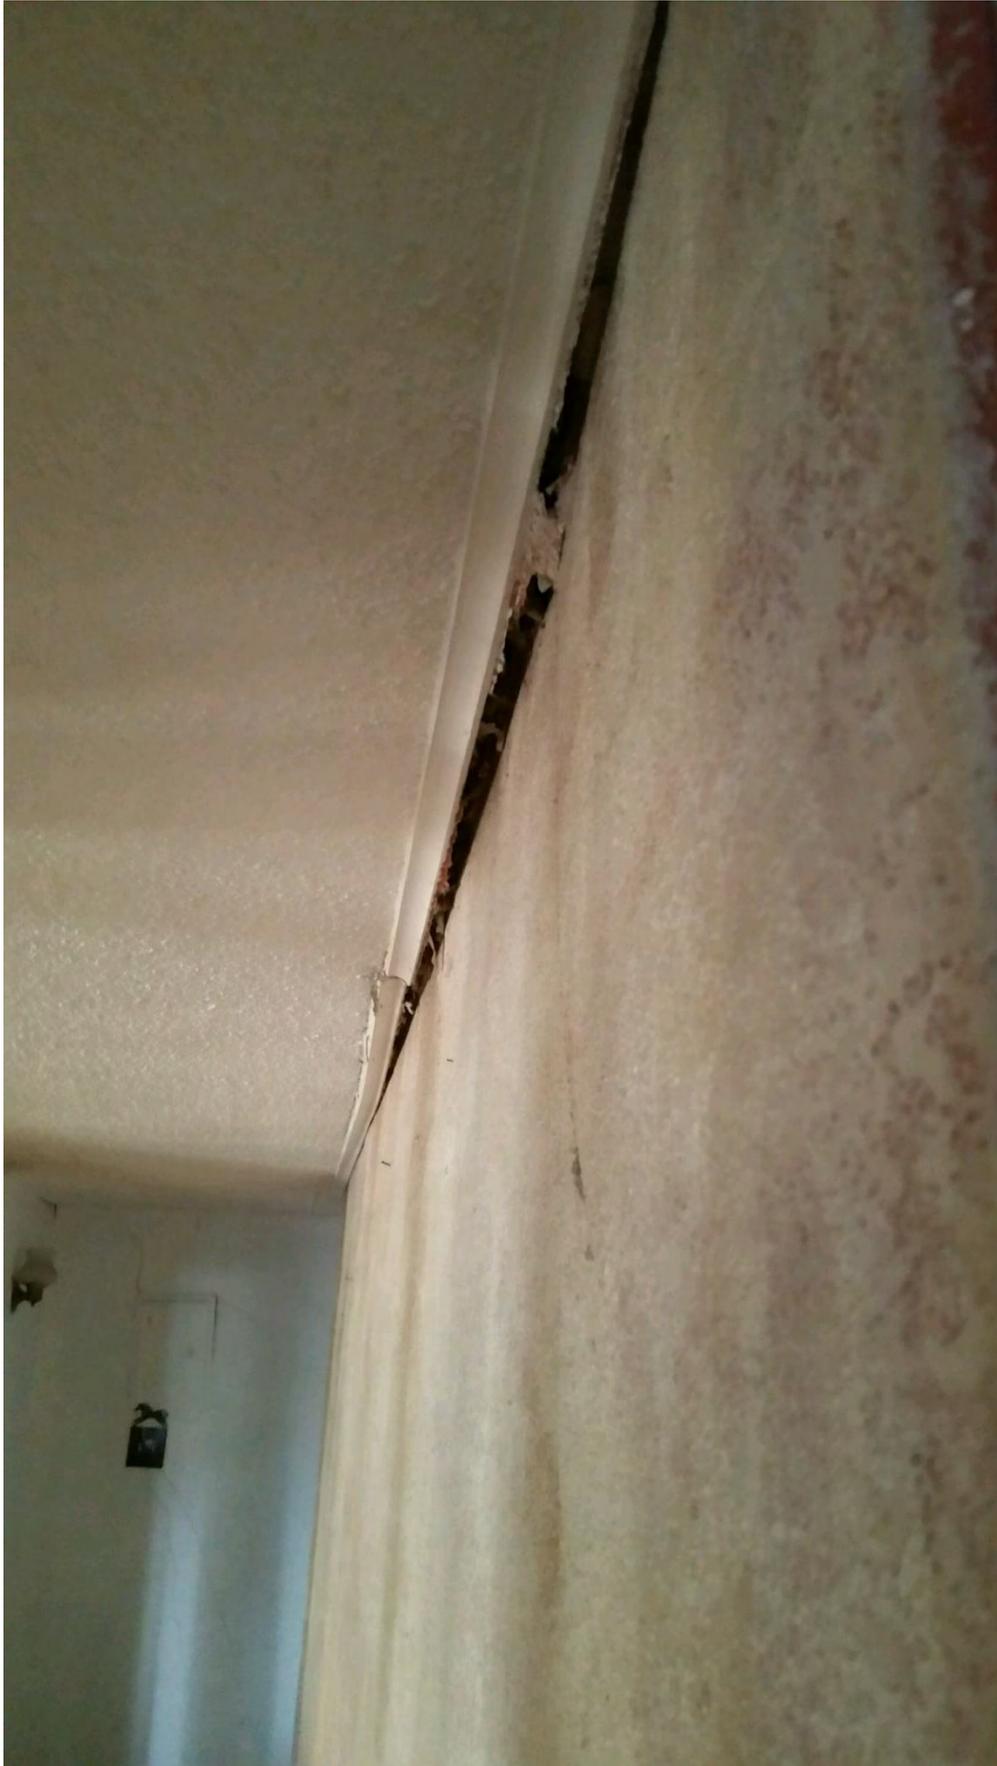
PHOTOS SHOWING DAMAGE INSIDE STRUCTURE CAUSED BY SETTLING
